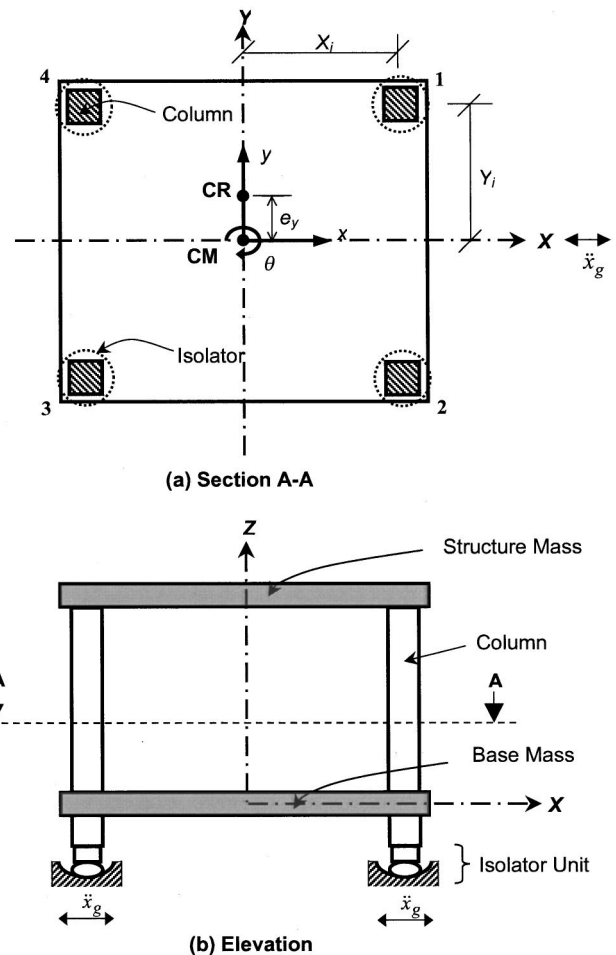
Schematic plan and elevation of asymmetric structure considered in this study
